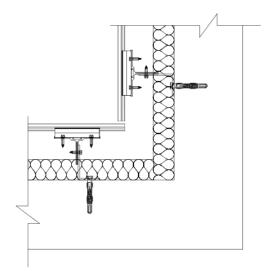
Tempio[®] FK kit with discontinuous rail profile. Concave corner.
